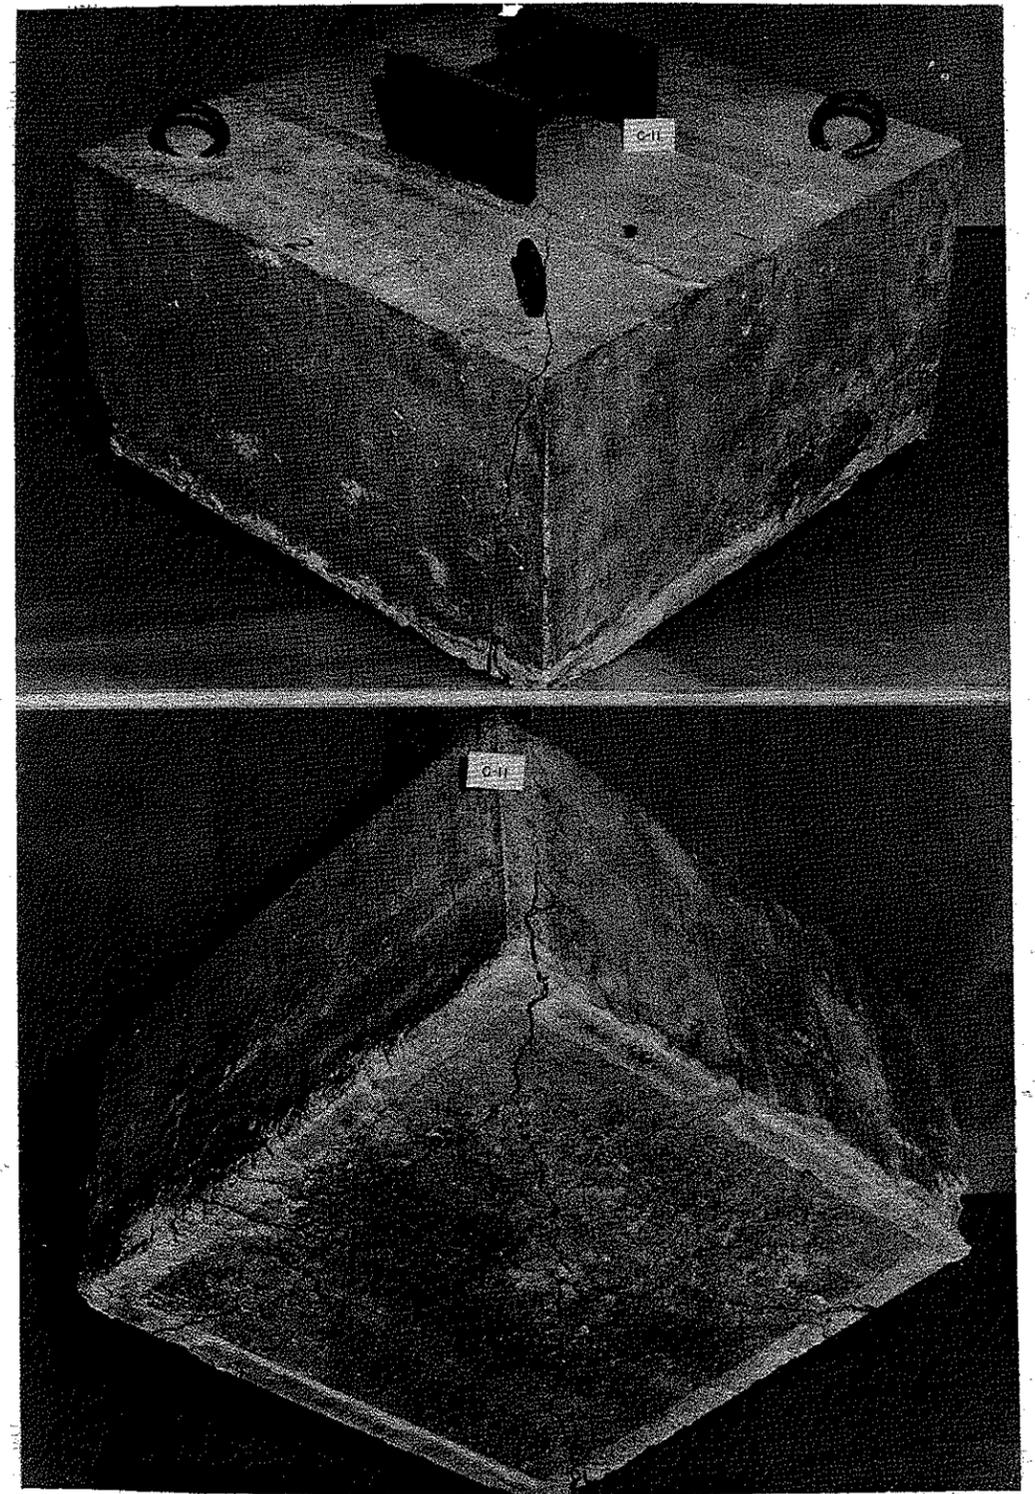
APPEARANCE OF SPECIMEN C-11 AFTER TESTING.
